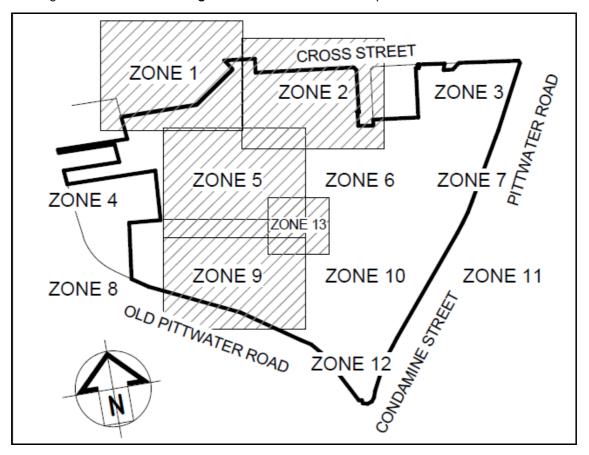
Zoning Plan – Warringah Mall showing the recent Stage 1 Development
